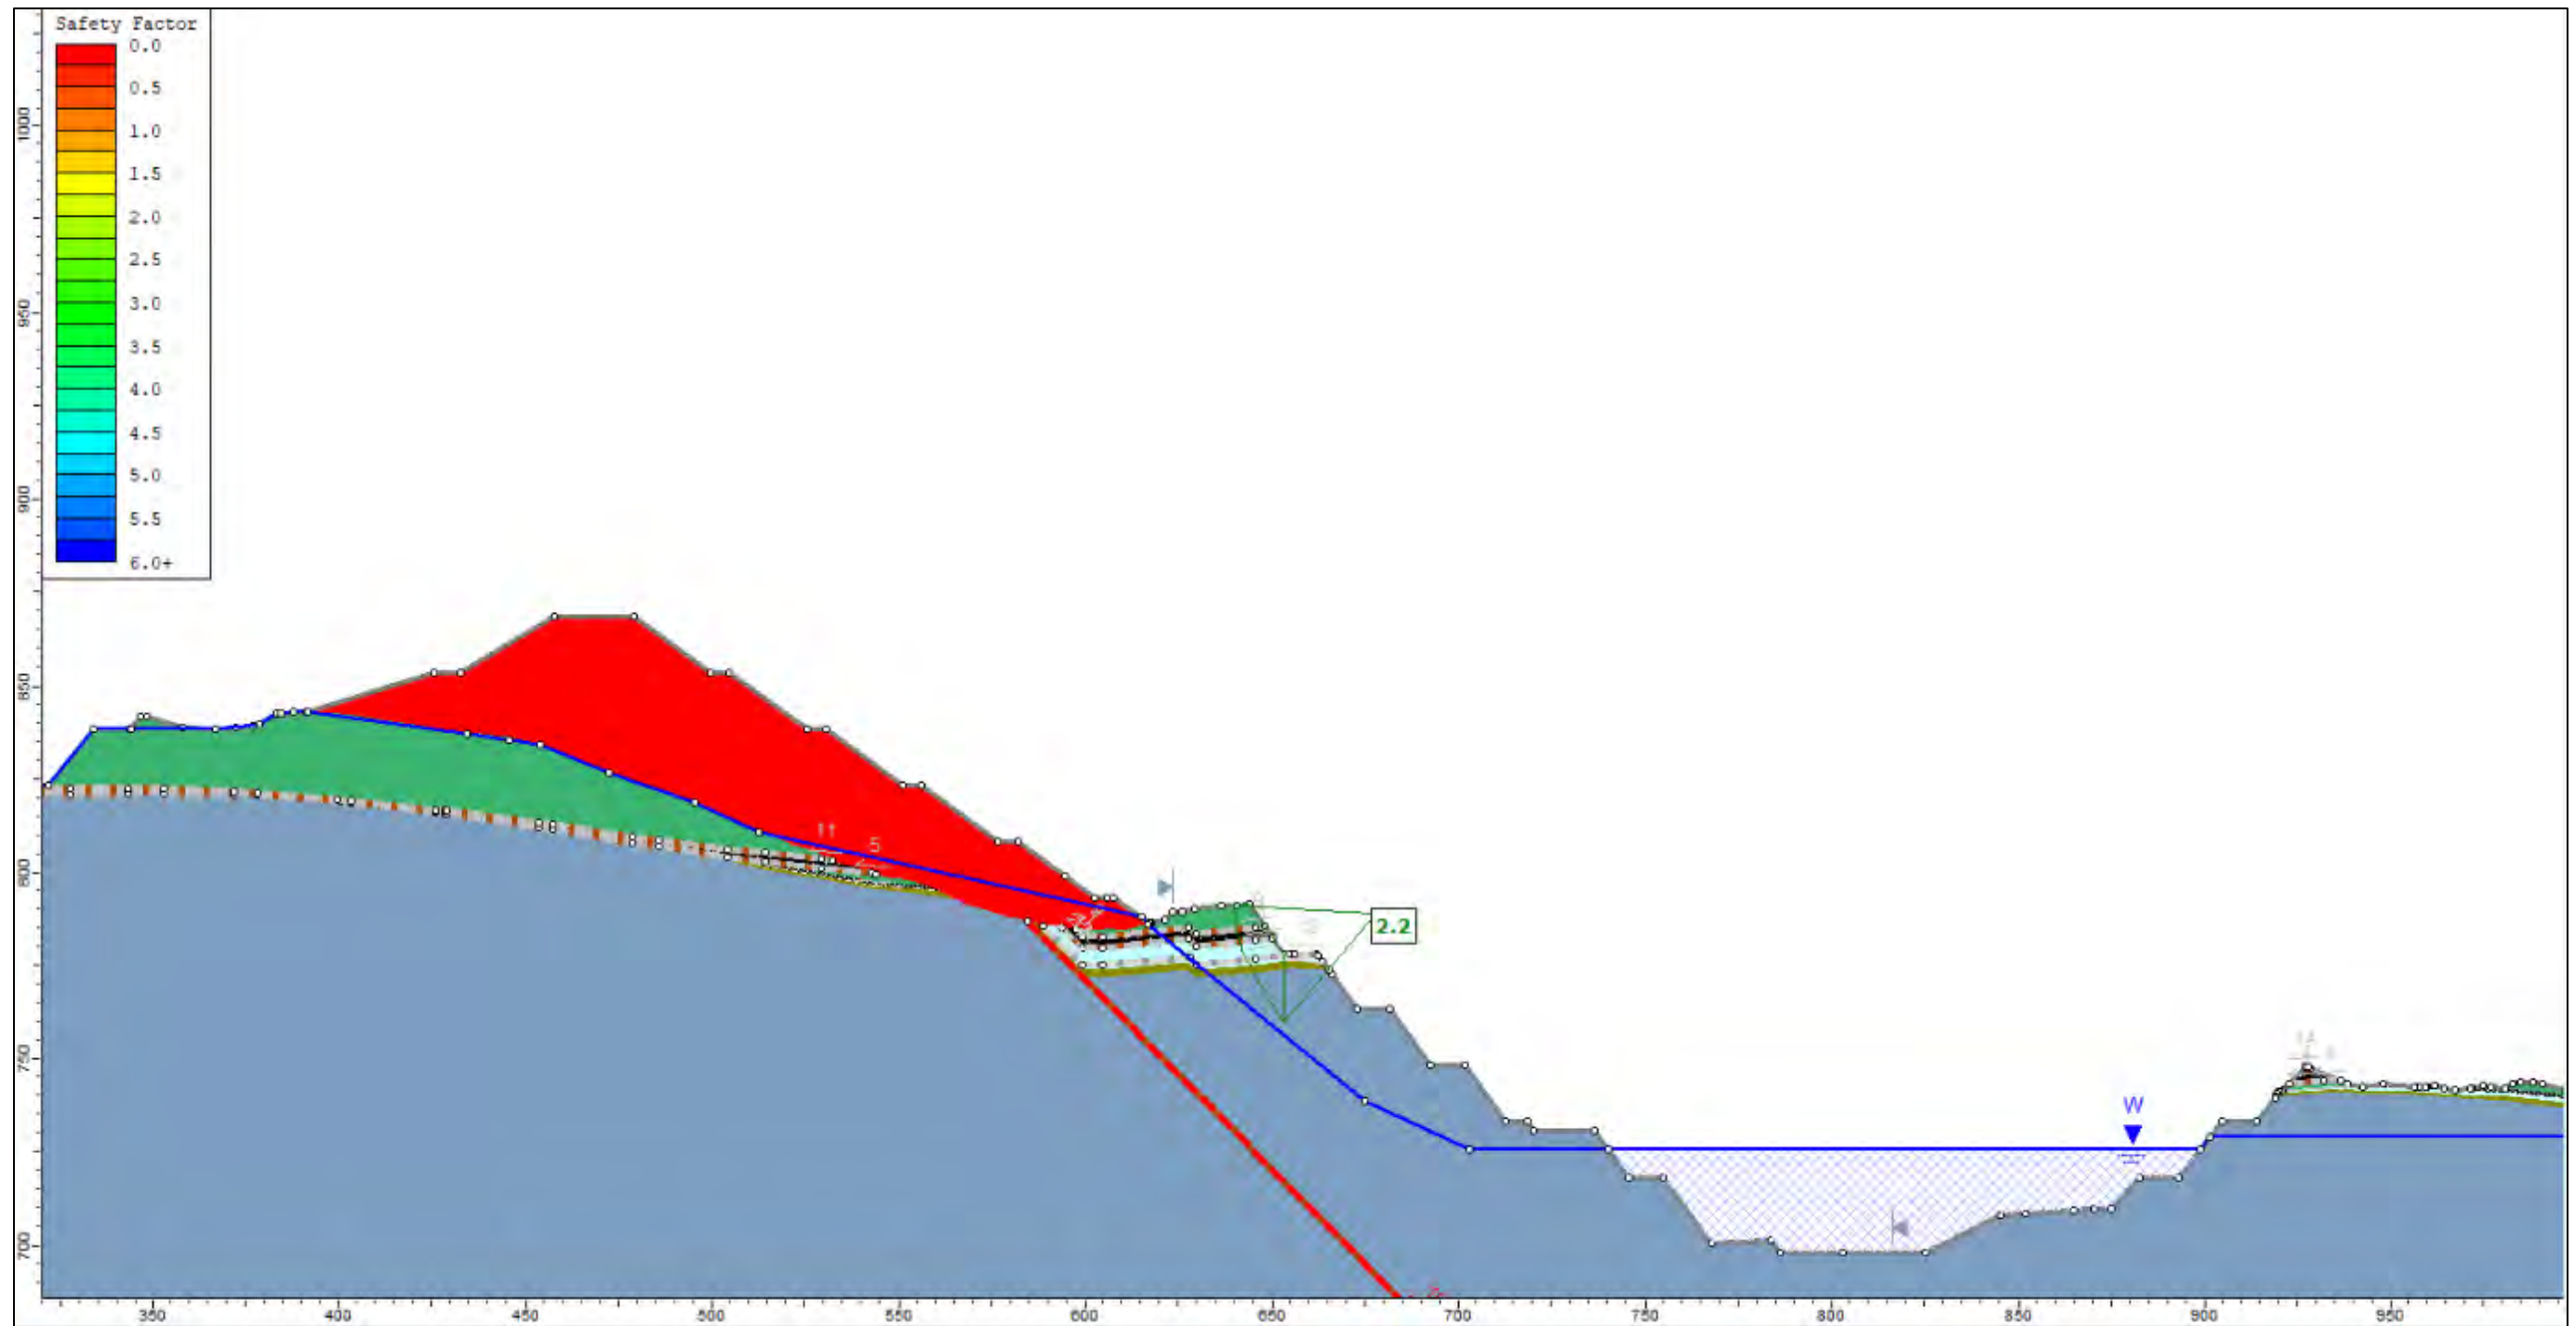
East Sump/Highwall - East Pit Section 103 –Elevated Groundwater Conditions.
